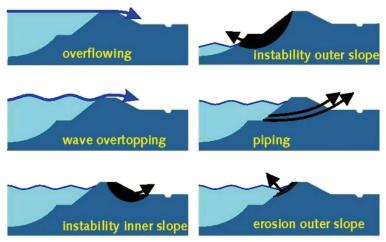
Failure mechanisms of an embankment (Netherlands Ministry of Infrastructure and Environment)
